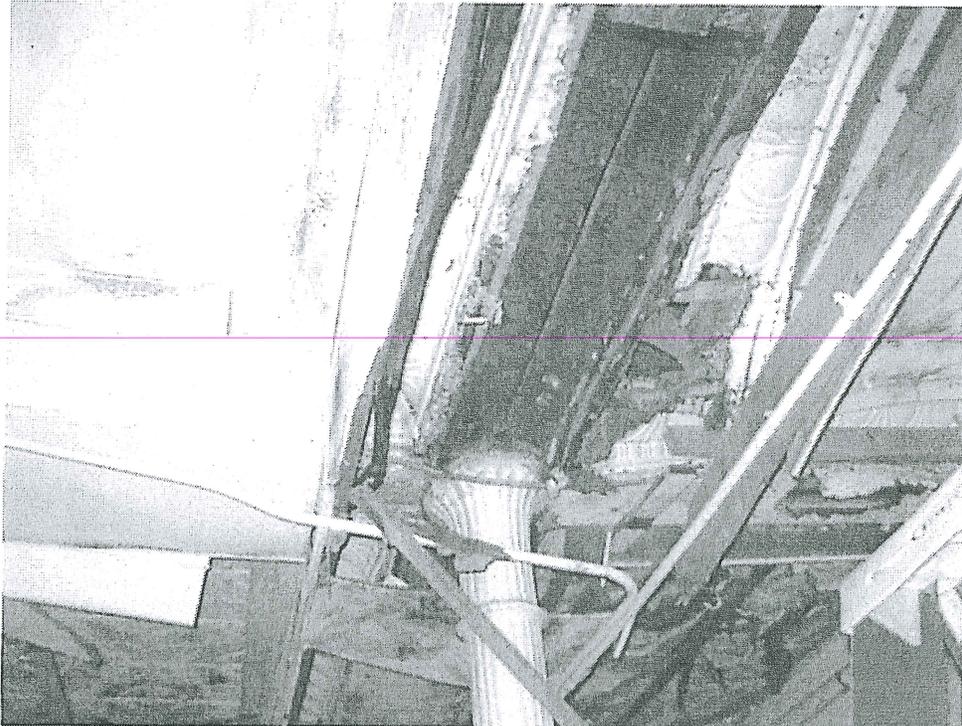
General The main girder at the fourth floor of the Reid and Hughes Building
